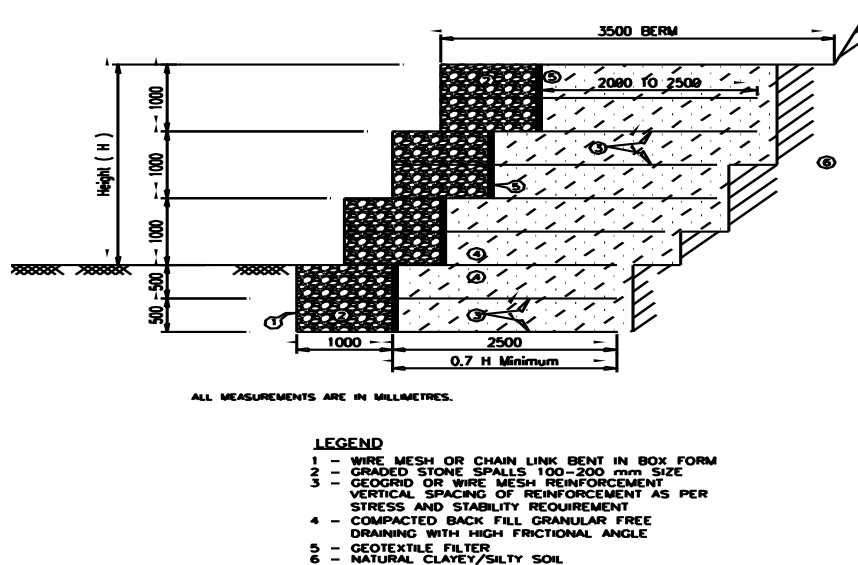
FLEXIBLE RETAINING WALL (TYPICAL)
